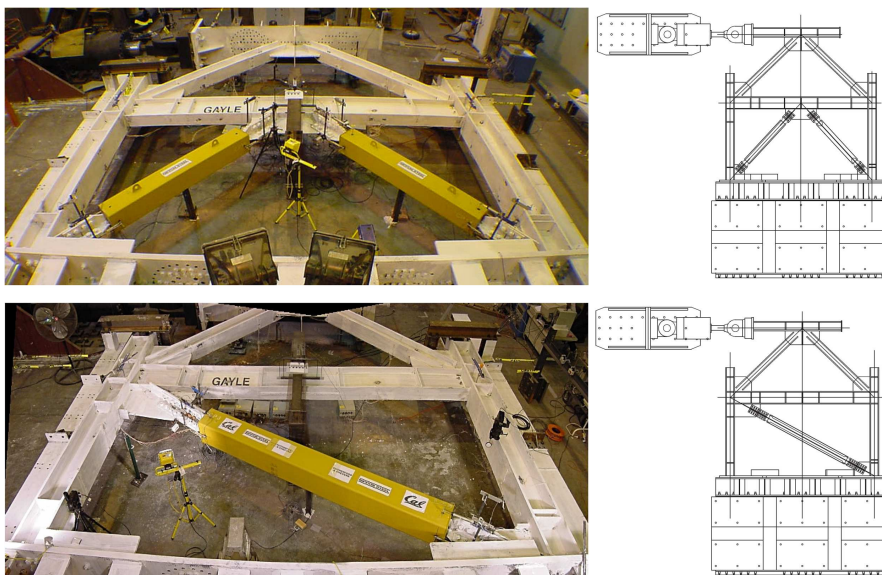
UC Berkeley Full-Scale Tests [49]
